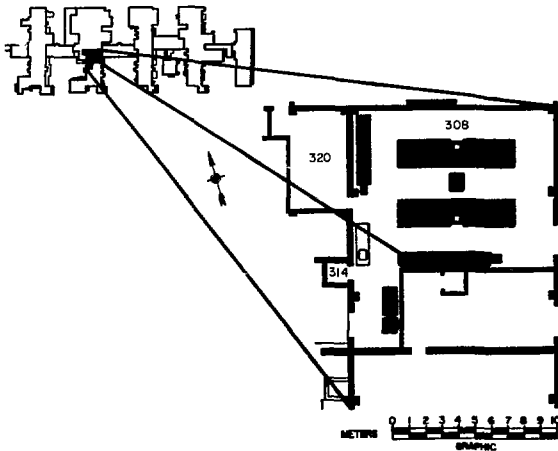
Floor plan of Room 308 and adjoining support rooms.
